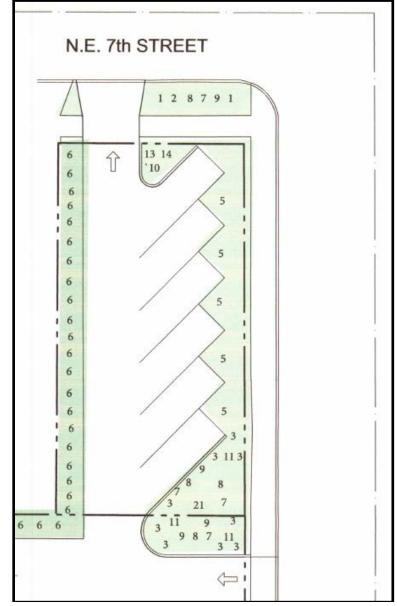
Landscape Plan Enlargement – Northern Parcel (R4420AD00100) Parking Area
